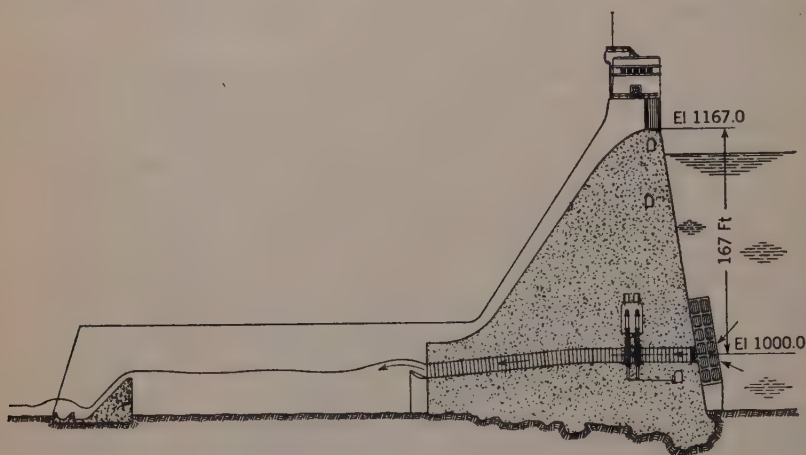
SPILLWAY SECTION, TYGART DAM
